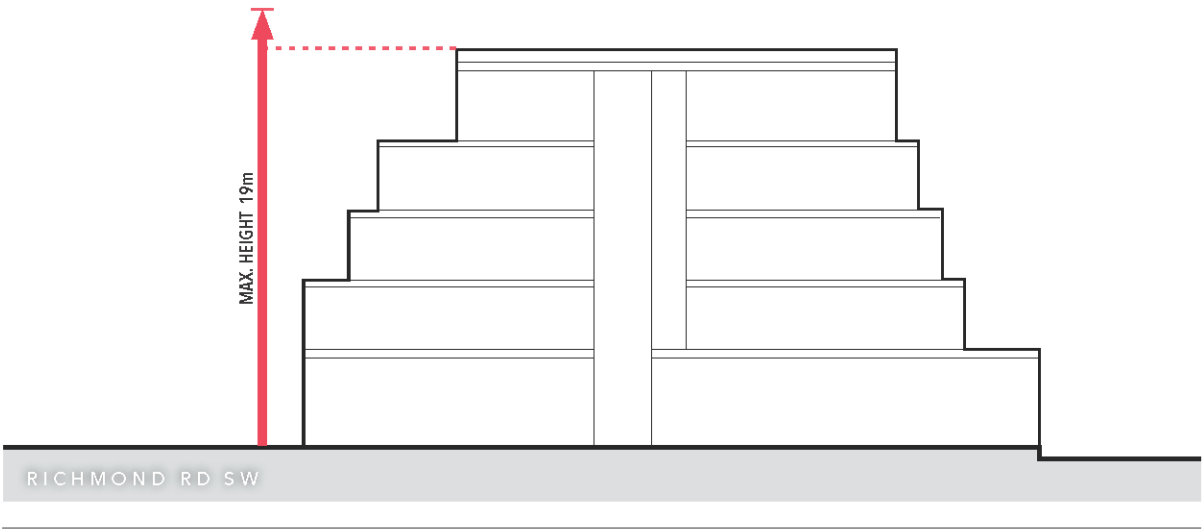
PROPOSED BUILDING HEIGHT MODIFIER
